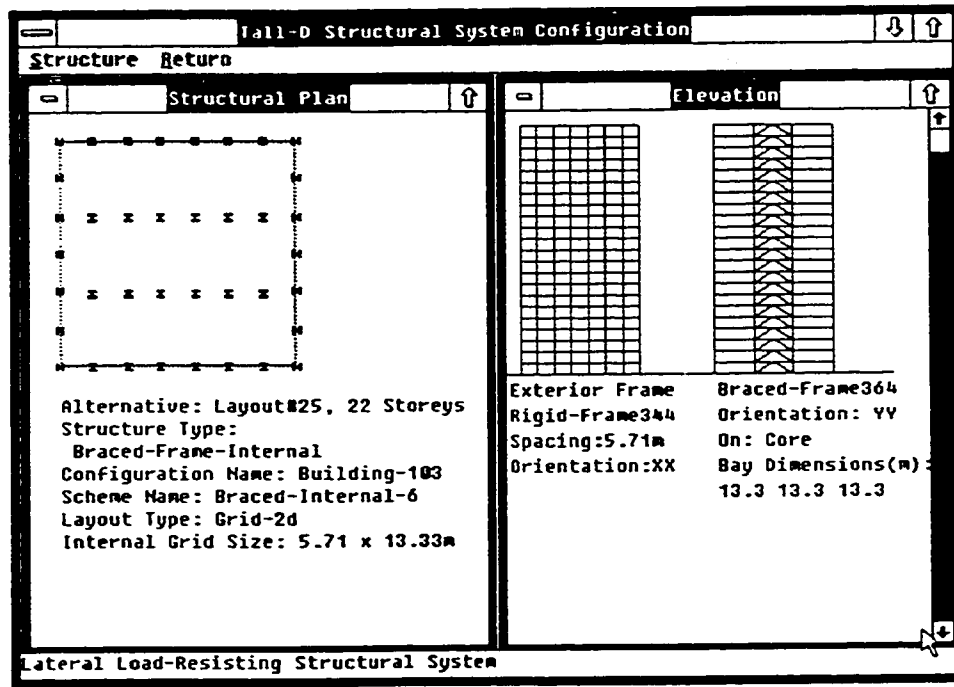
(e) Braced frame structural alternative for Layout#25: Braces located in the core. Column grid 5.71x13.33m.
